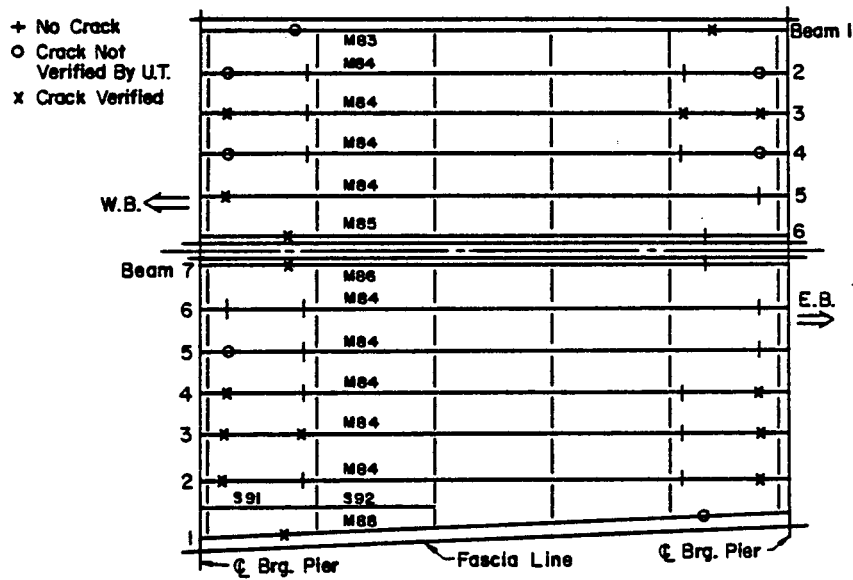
Plan of Inspected Details in Span 10, Yellow Mill Pond Bridge
